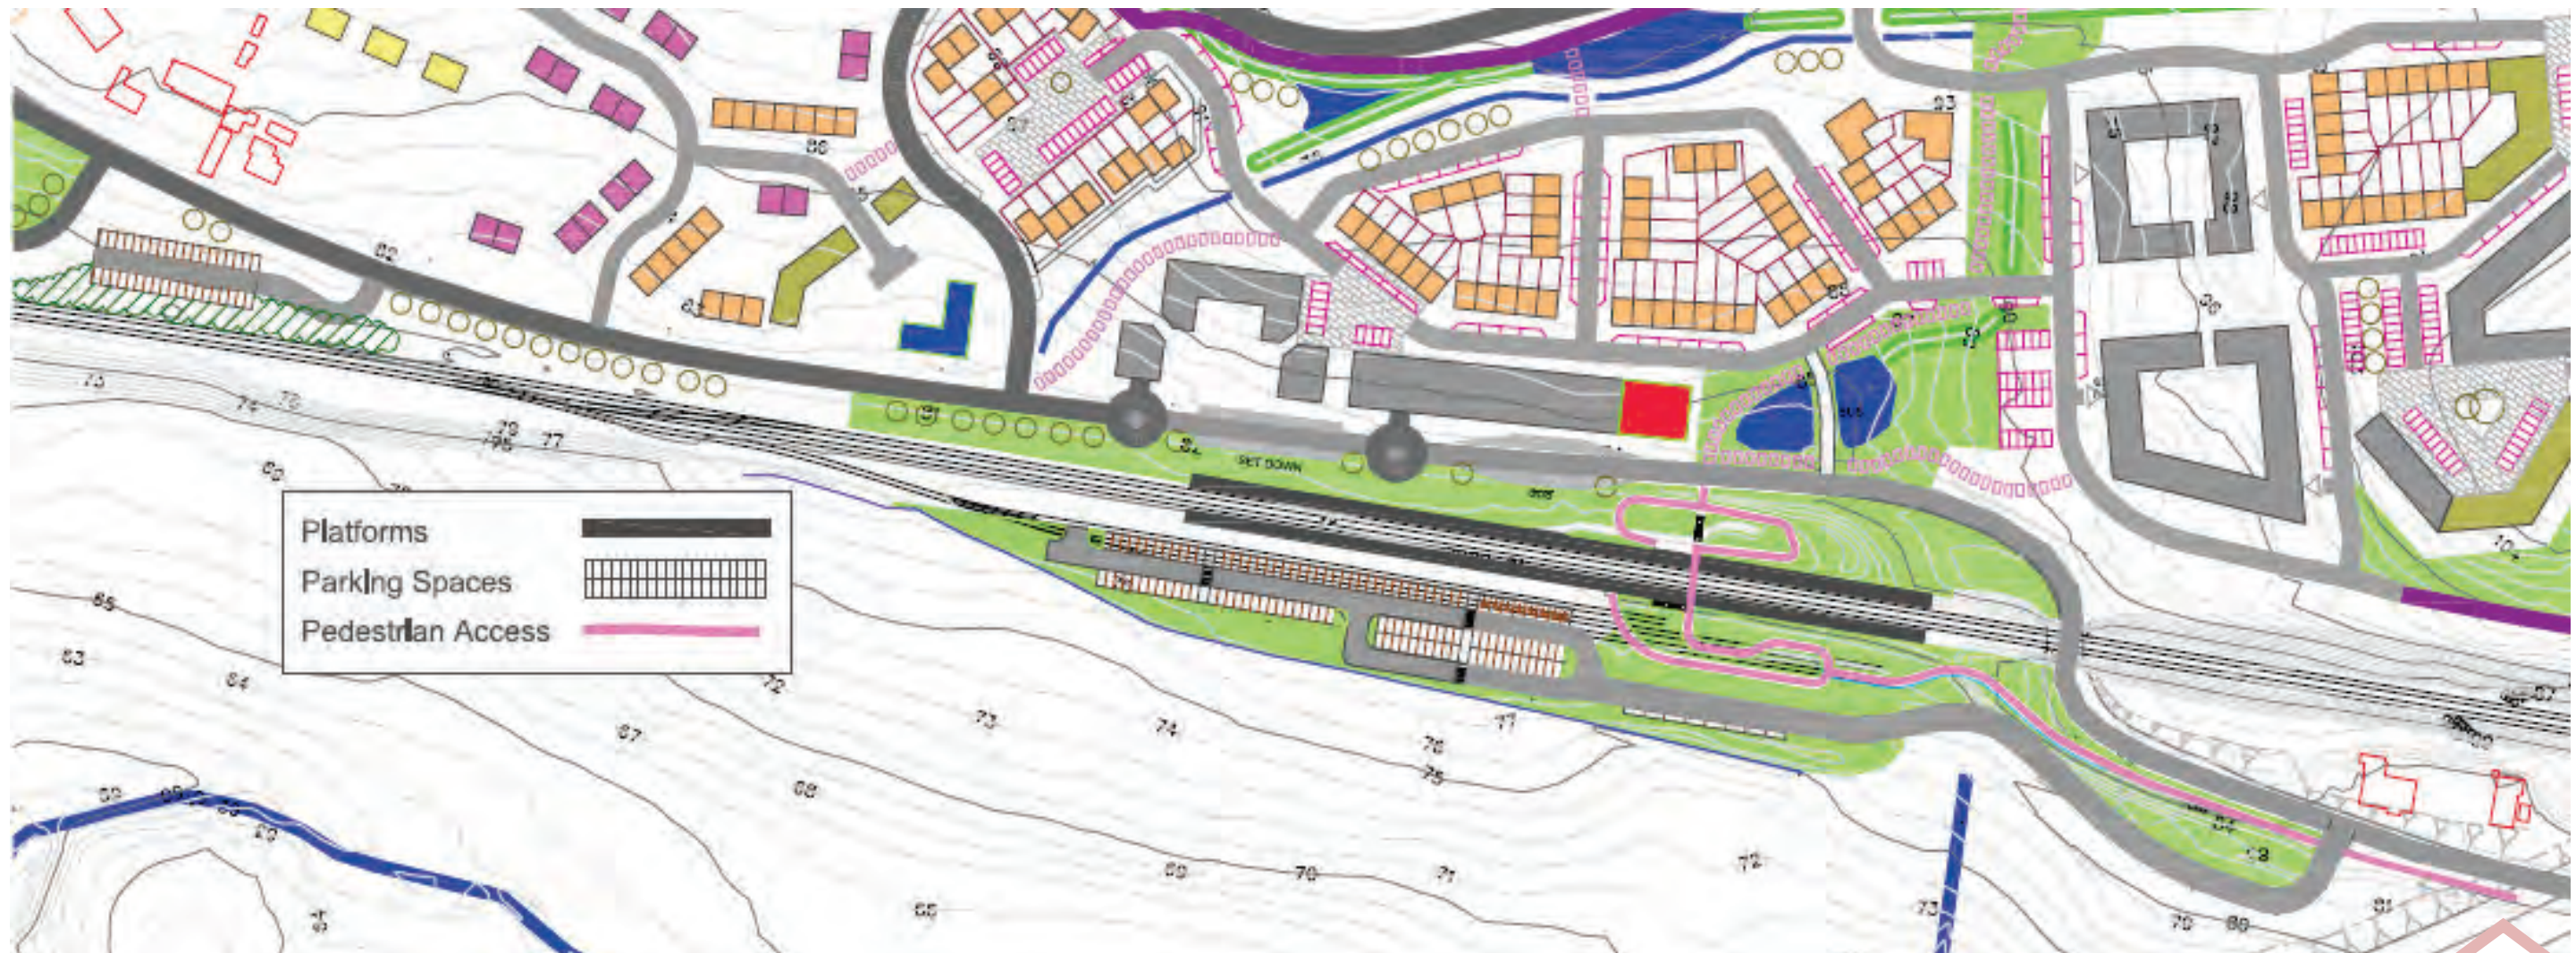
Overview of Station Layout and associated parking and pedestrian access
